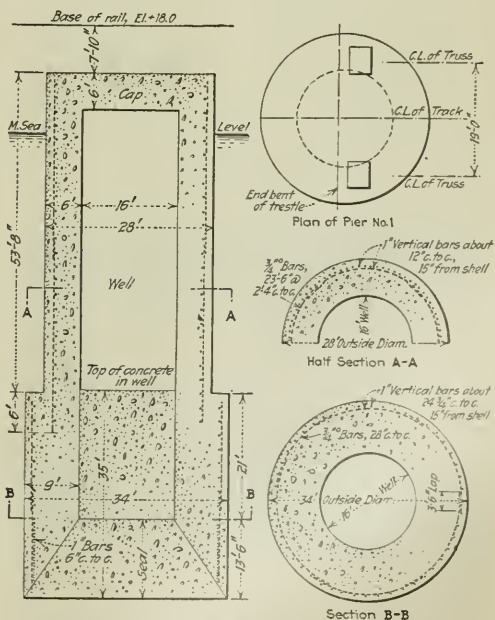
TYPICAL CONCRETE CYLINDER PIER
